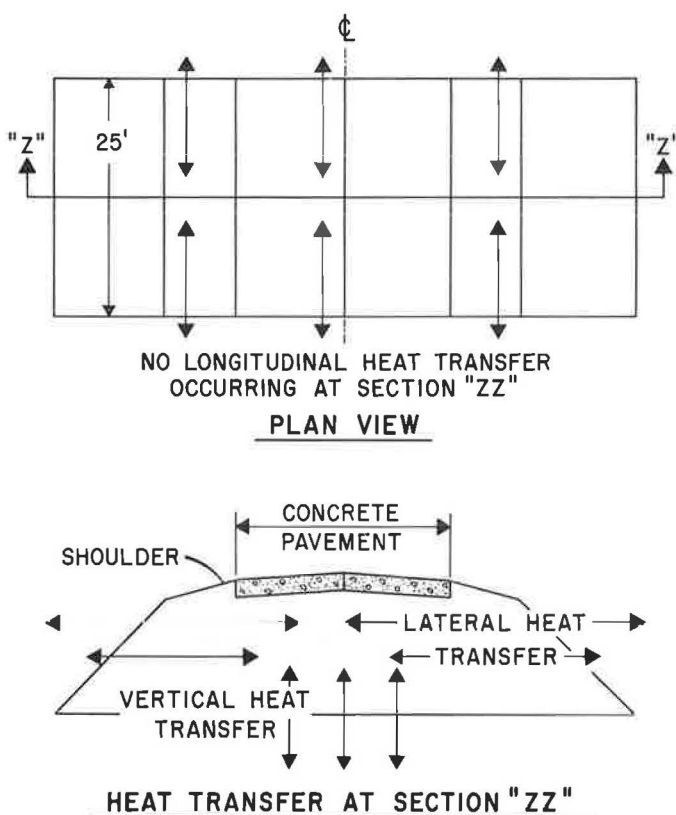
Thermal conditions found in a non-continuous test section (test site just meeting minimum length requirements).
